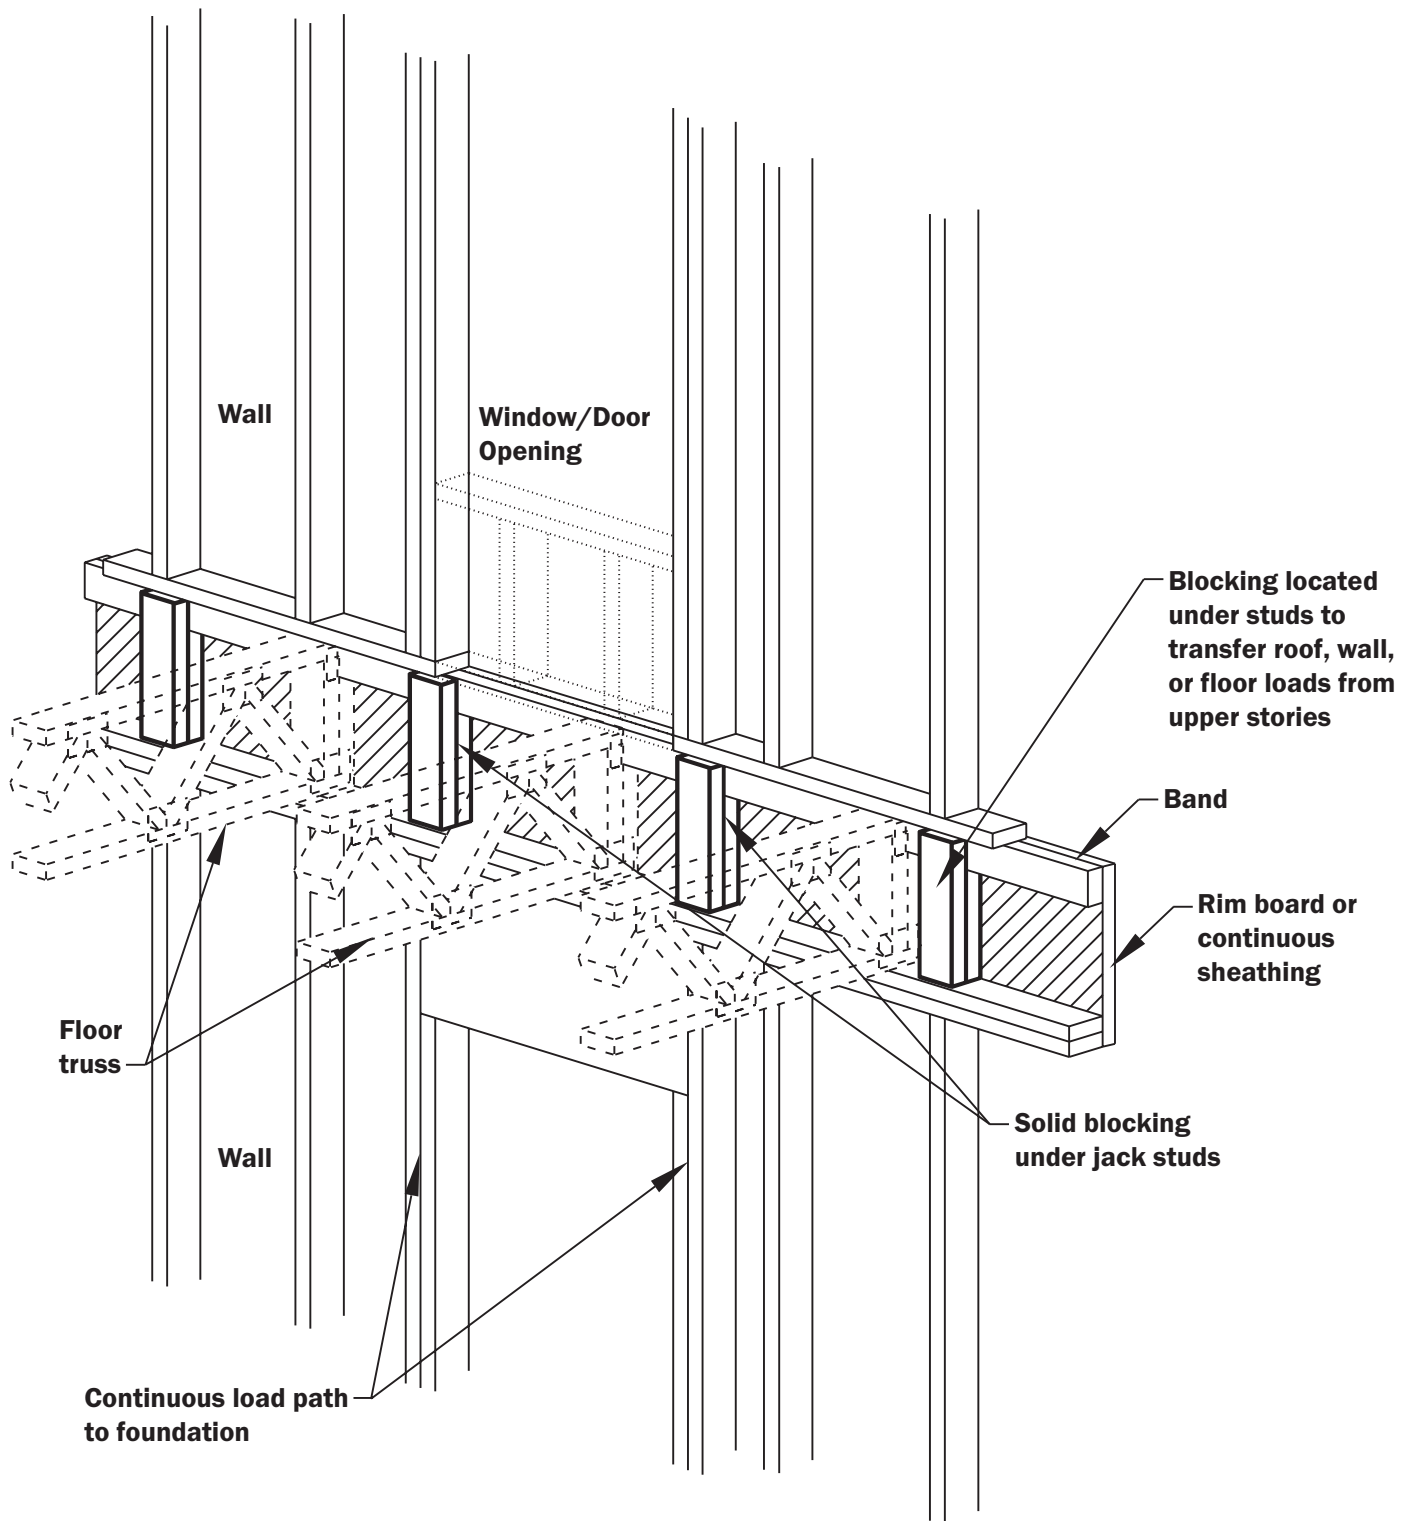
Blocking in Floor Space at End Bearing Truss With Band
